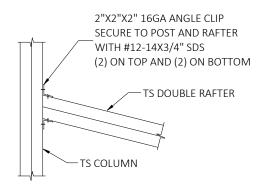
A LEAN TO RAFTER/COLUMN CONNECTION FOR RAFTER SPANS LESS THAN 12'-0"
